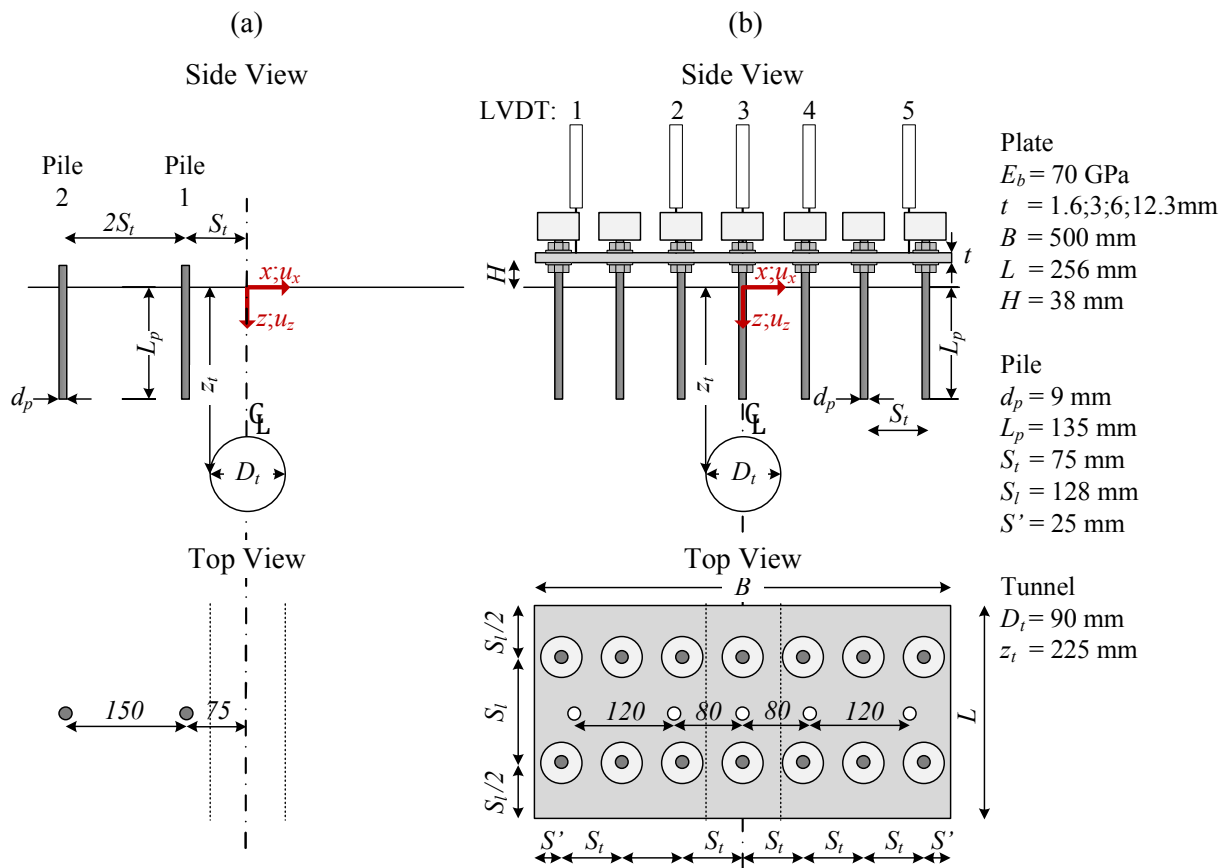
Test layout (in model scale): (a) loading tests and (b) tunnelling beneath piled plate.
